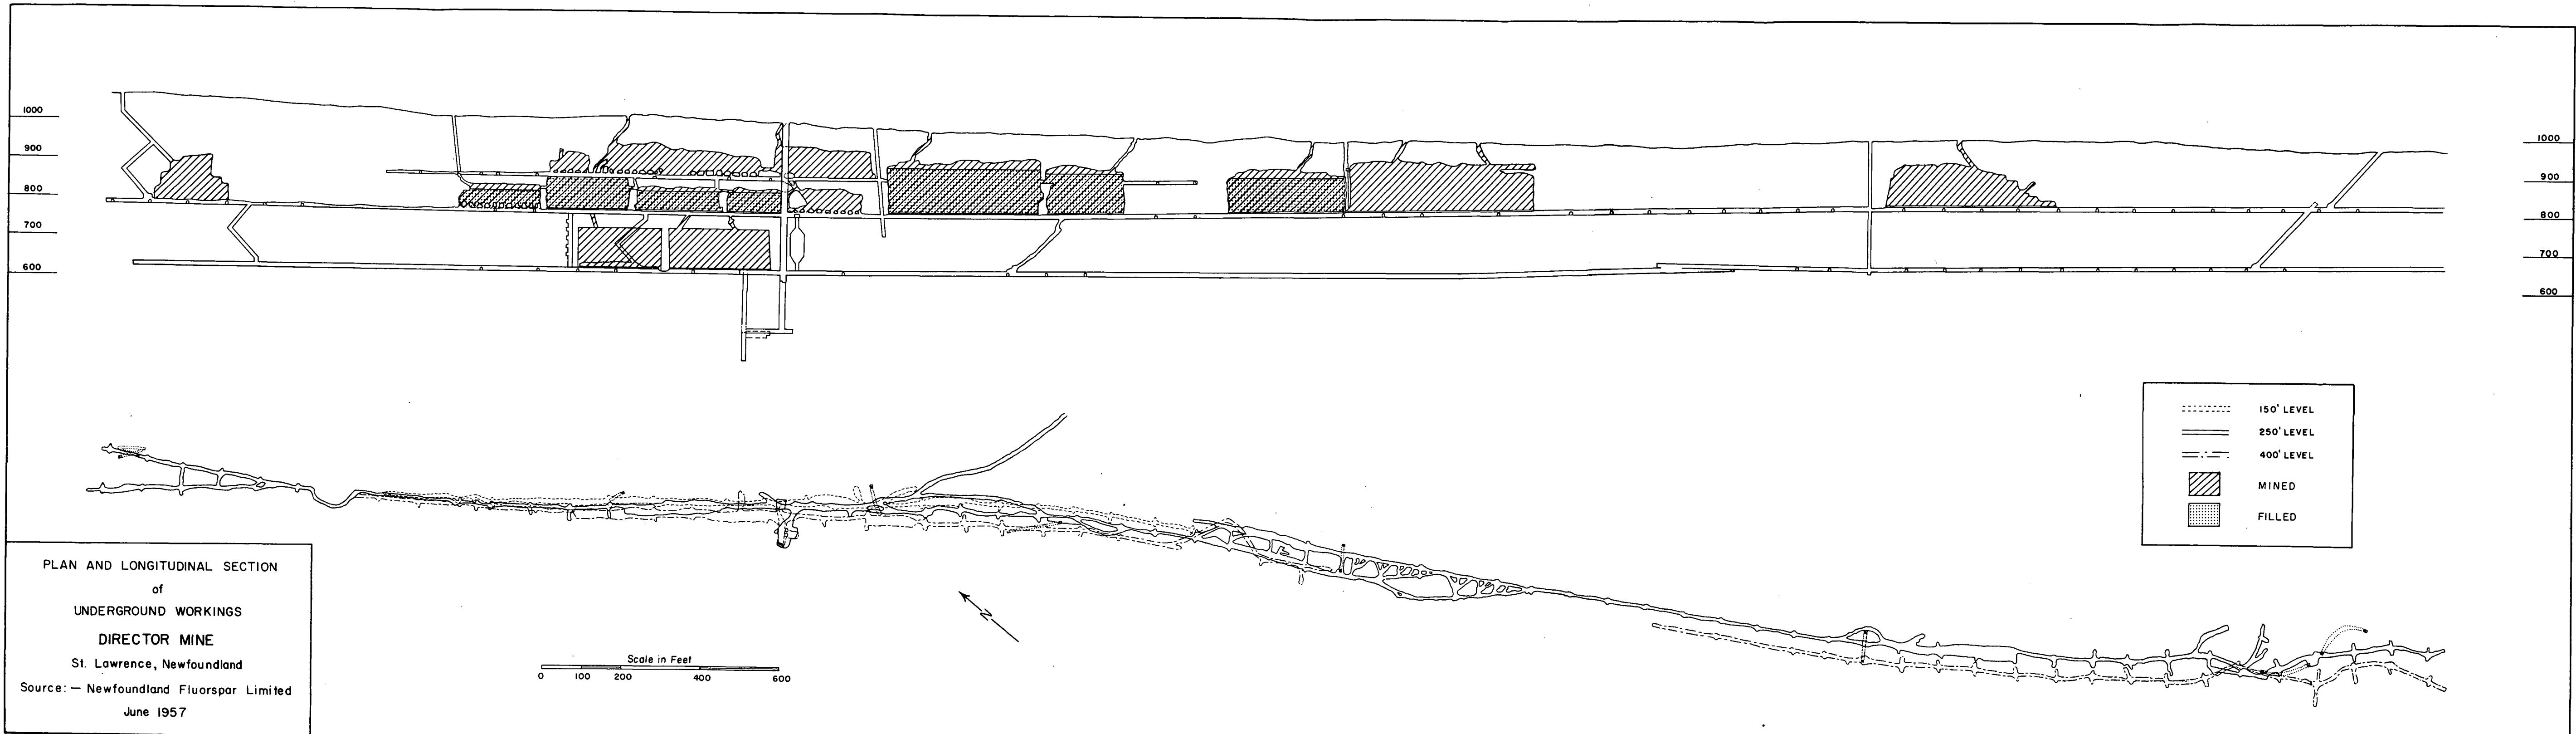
Plan and longitudinal section of underground workings, Director mine, Newfoundland Fluorspar Limited, St. Lawrence, Newfoundland.
